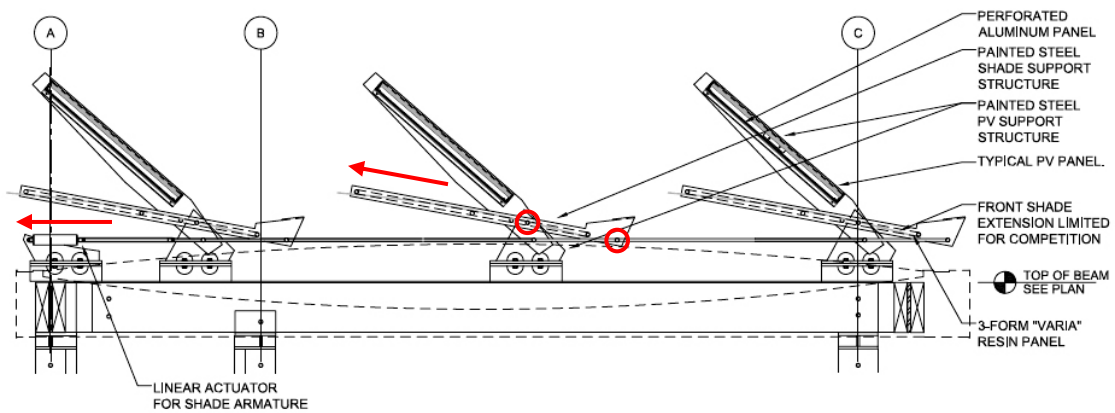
Typical section – shades in half extension (Fall, 2006).
